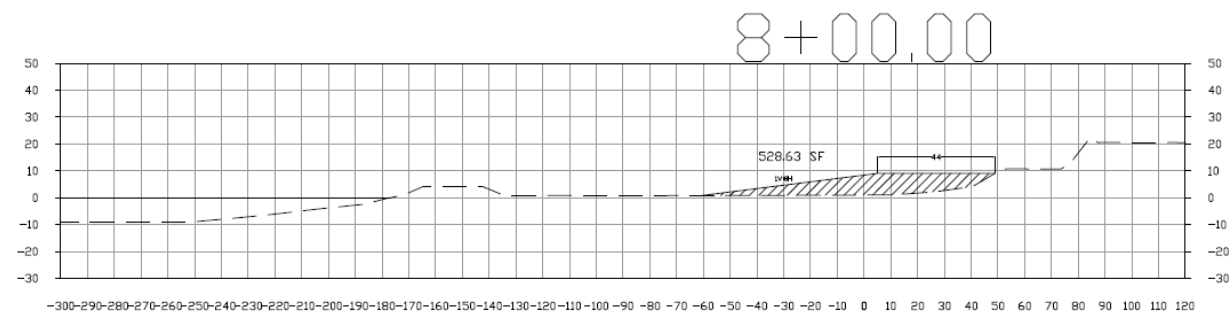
(d). Typical beach fill cross-section at Sta 8+00
